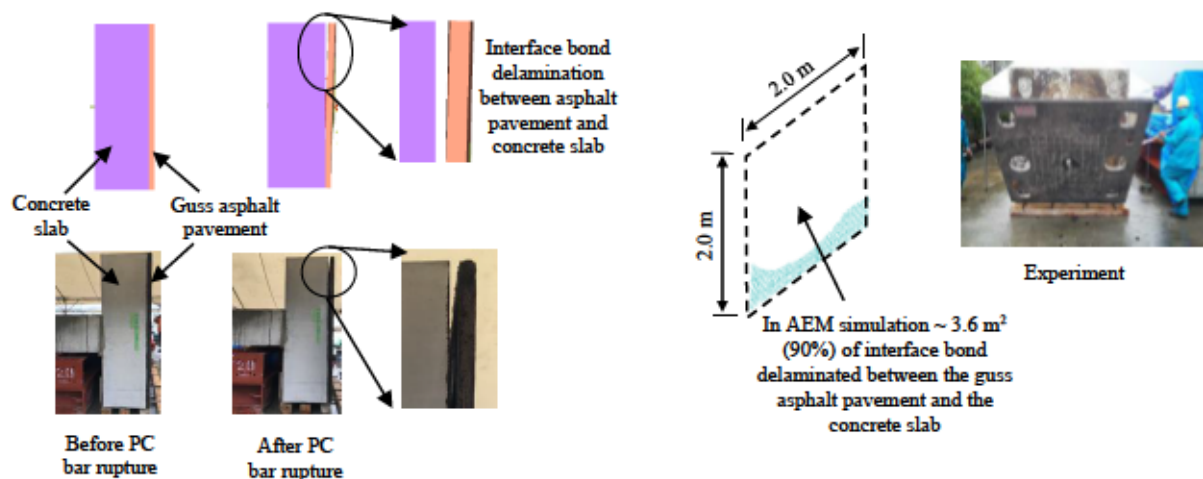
Interface bond separation between asphalt pavement and concrete slab [10]
